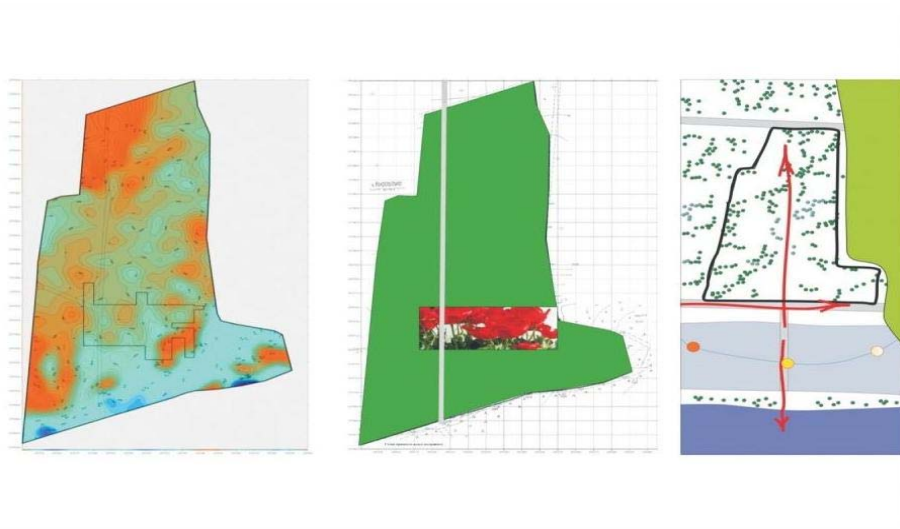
Friend House Hotel- Park Zones Landscape Plan (<http://www.archdaily.com/51767/friendhouse>)
